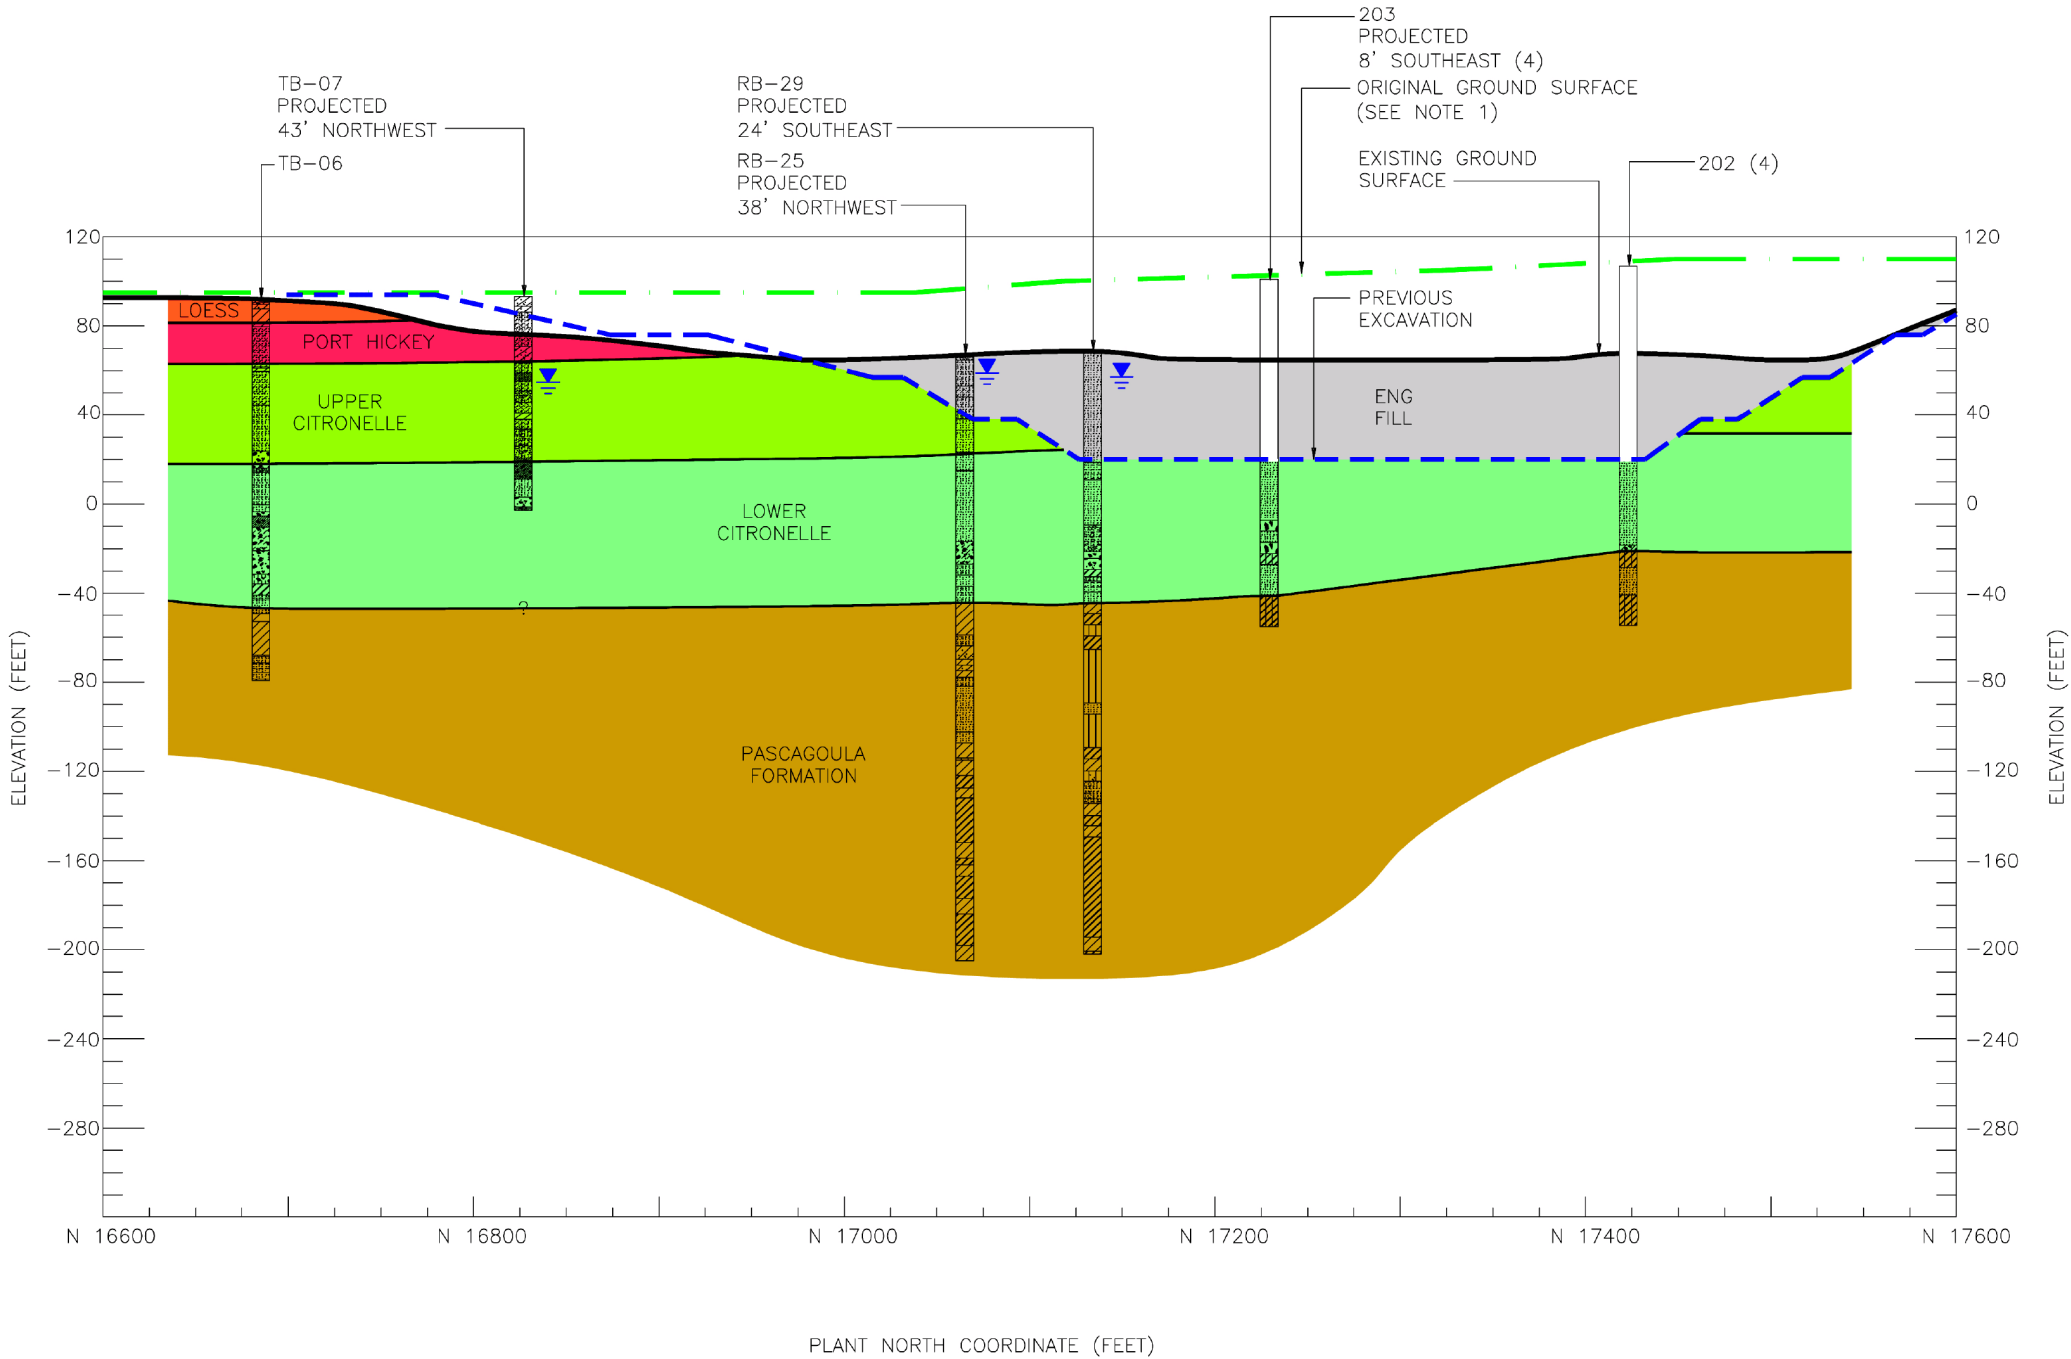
North-South Cross Section through Unit 3 Site Location
